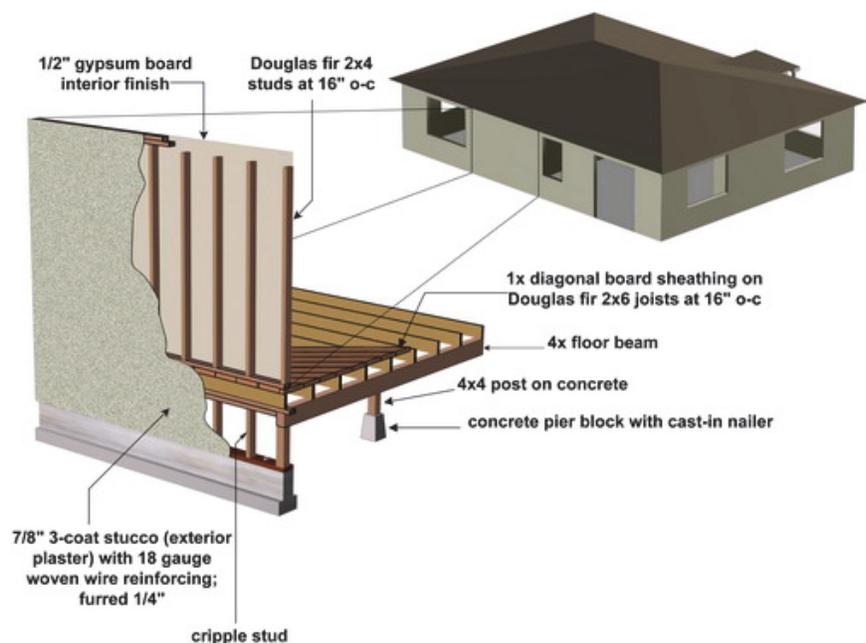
Typical wall construction for older single-story houses in California—sheathing materials may vary (image credit: CUREE).
